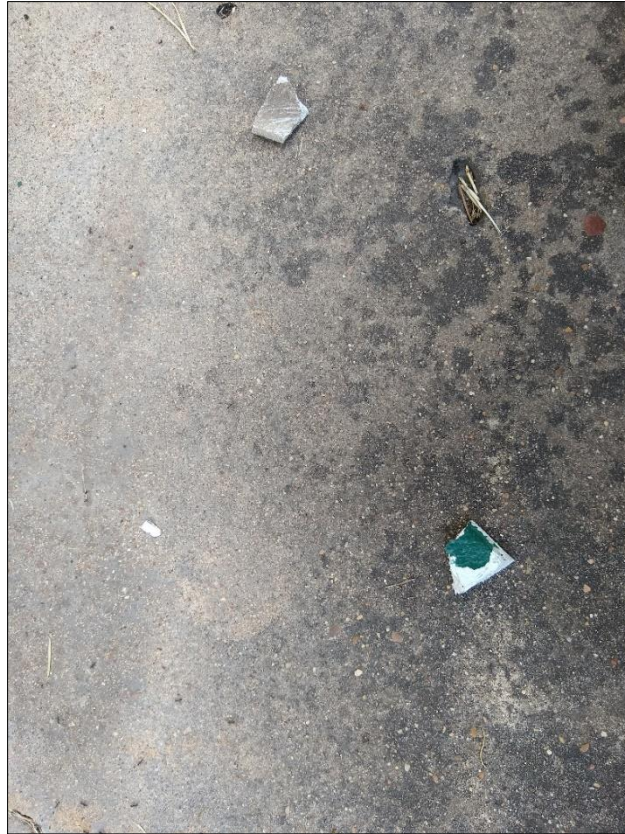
Fibro fragments F2/JRK identified on concrete pavement along the north eastern side of Building 8.
